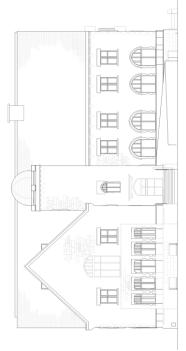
Sketch west elevation, not to scale. (JLK Architects 2025)
